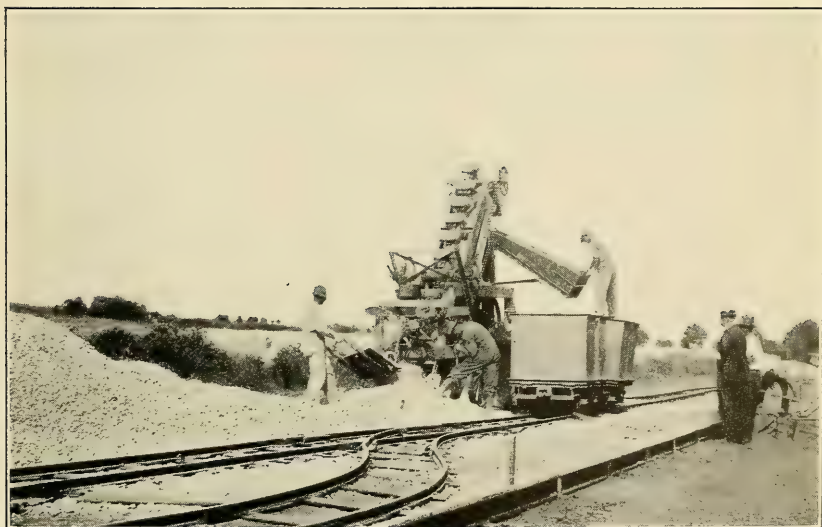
LOADING BATCH BOXES FROM SMALL STOCK PILES ON THE SIDE OF THE ROAD WITH A BUCKET ELEVATOR.
